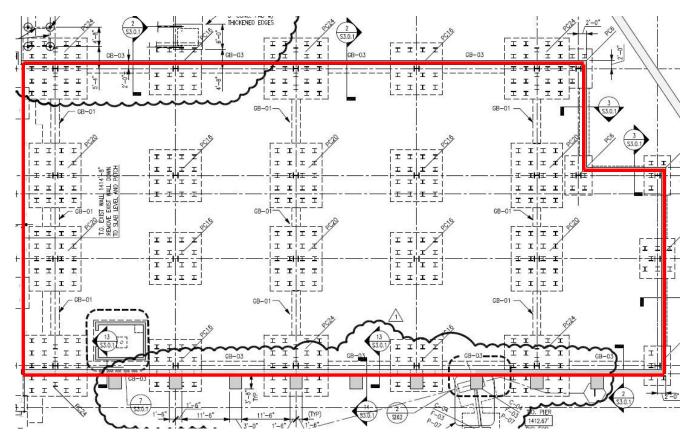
Steel Pile/Pile Caps Plan Drawings Courtesy of JCJ Architecture
